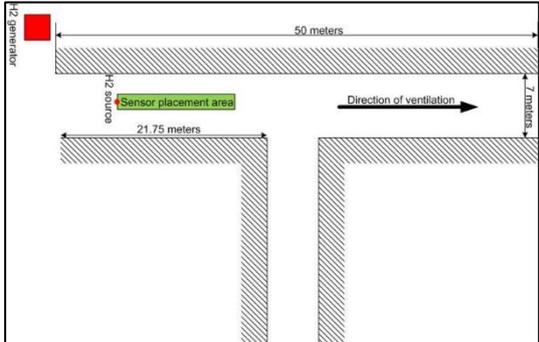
(a). Kloppersbos experimental tunnel and layout.
